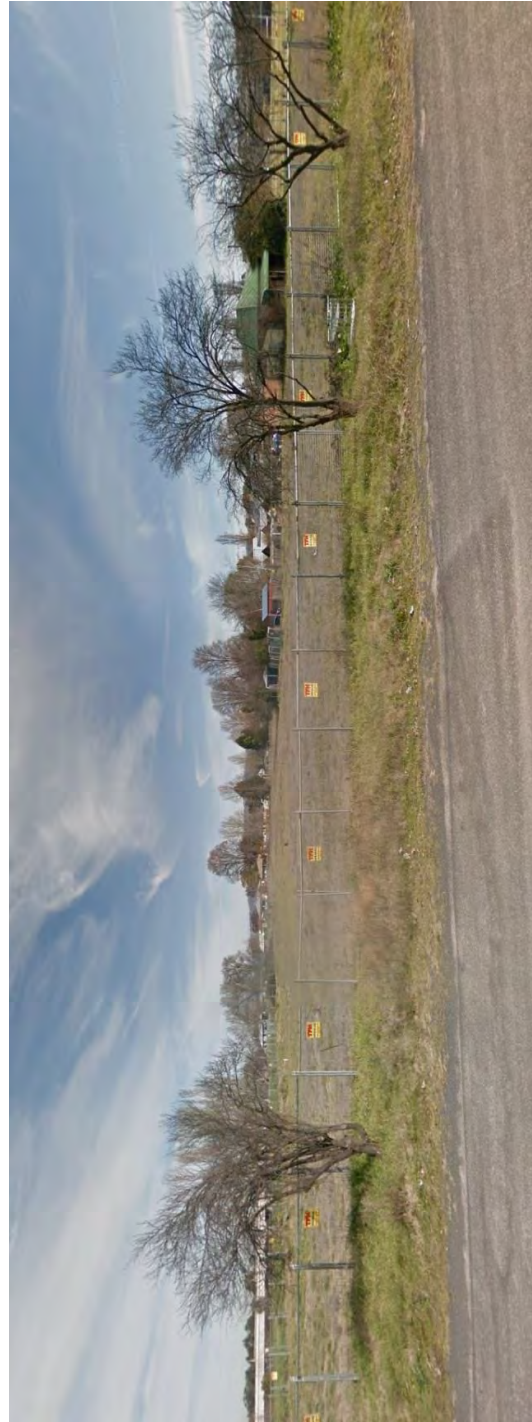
Looking toward the site from the intersection of Havannah and Bailie Streets.
